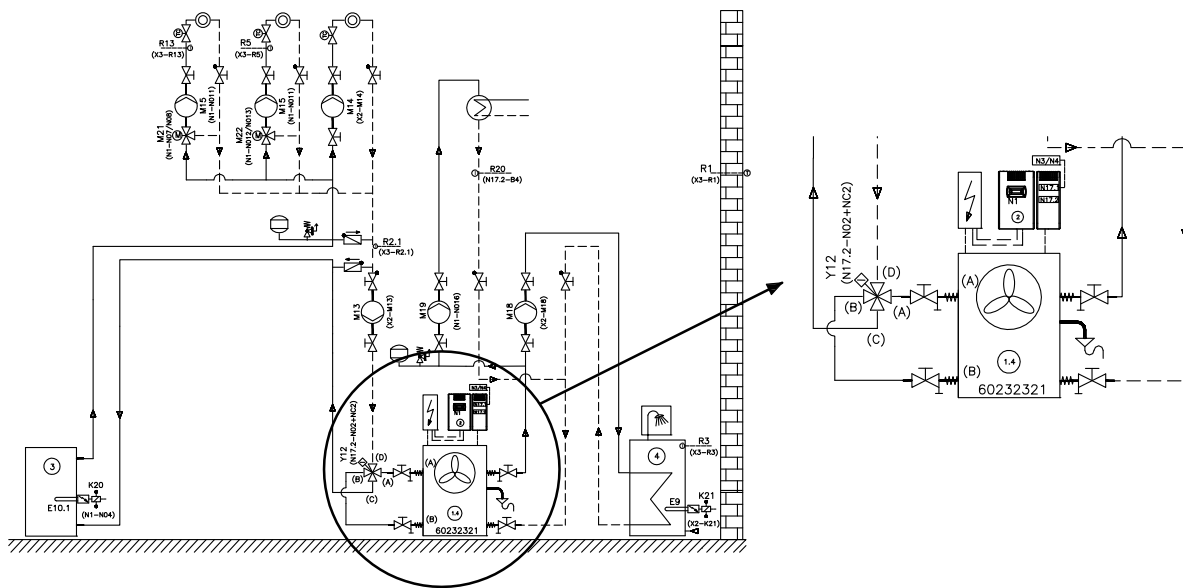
Sample view of complete hydraulic assembly (example)
